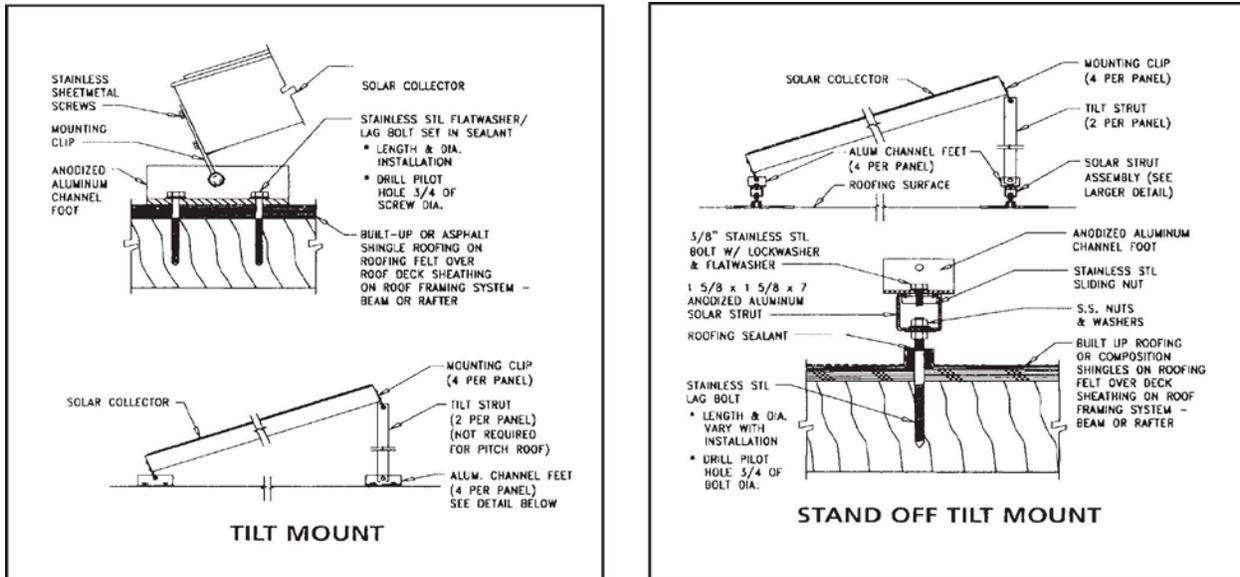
This detail is an example of a typical solar roof mount application. All equipment should be installed in accordance with all local codes and best practices as identified with National Roofing Contractors Association (NRCA) or other qualified body.
